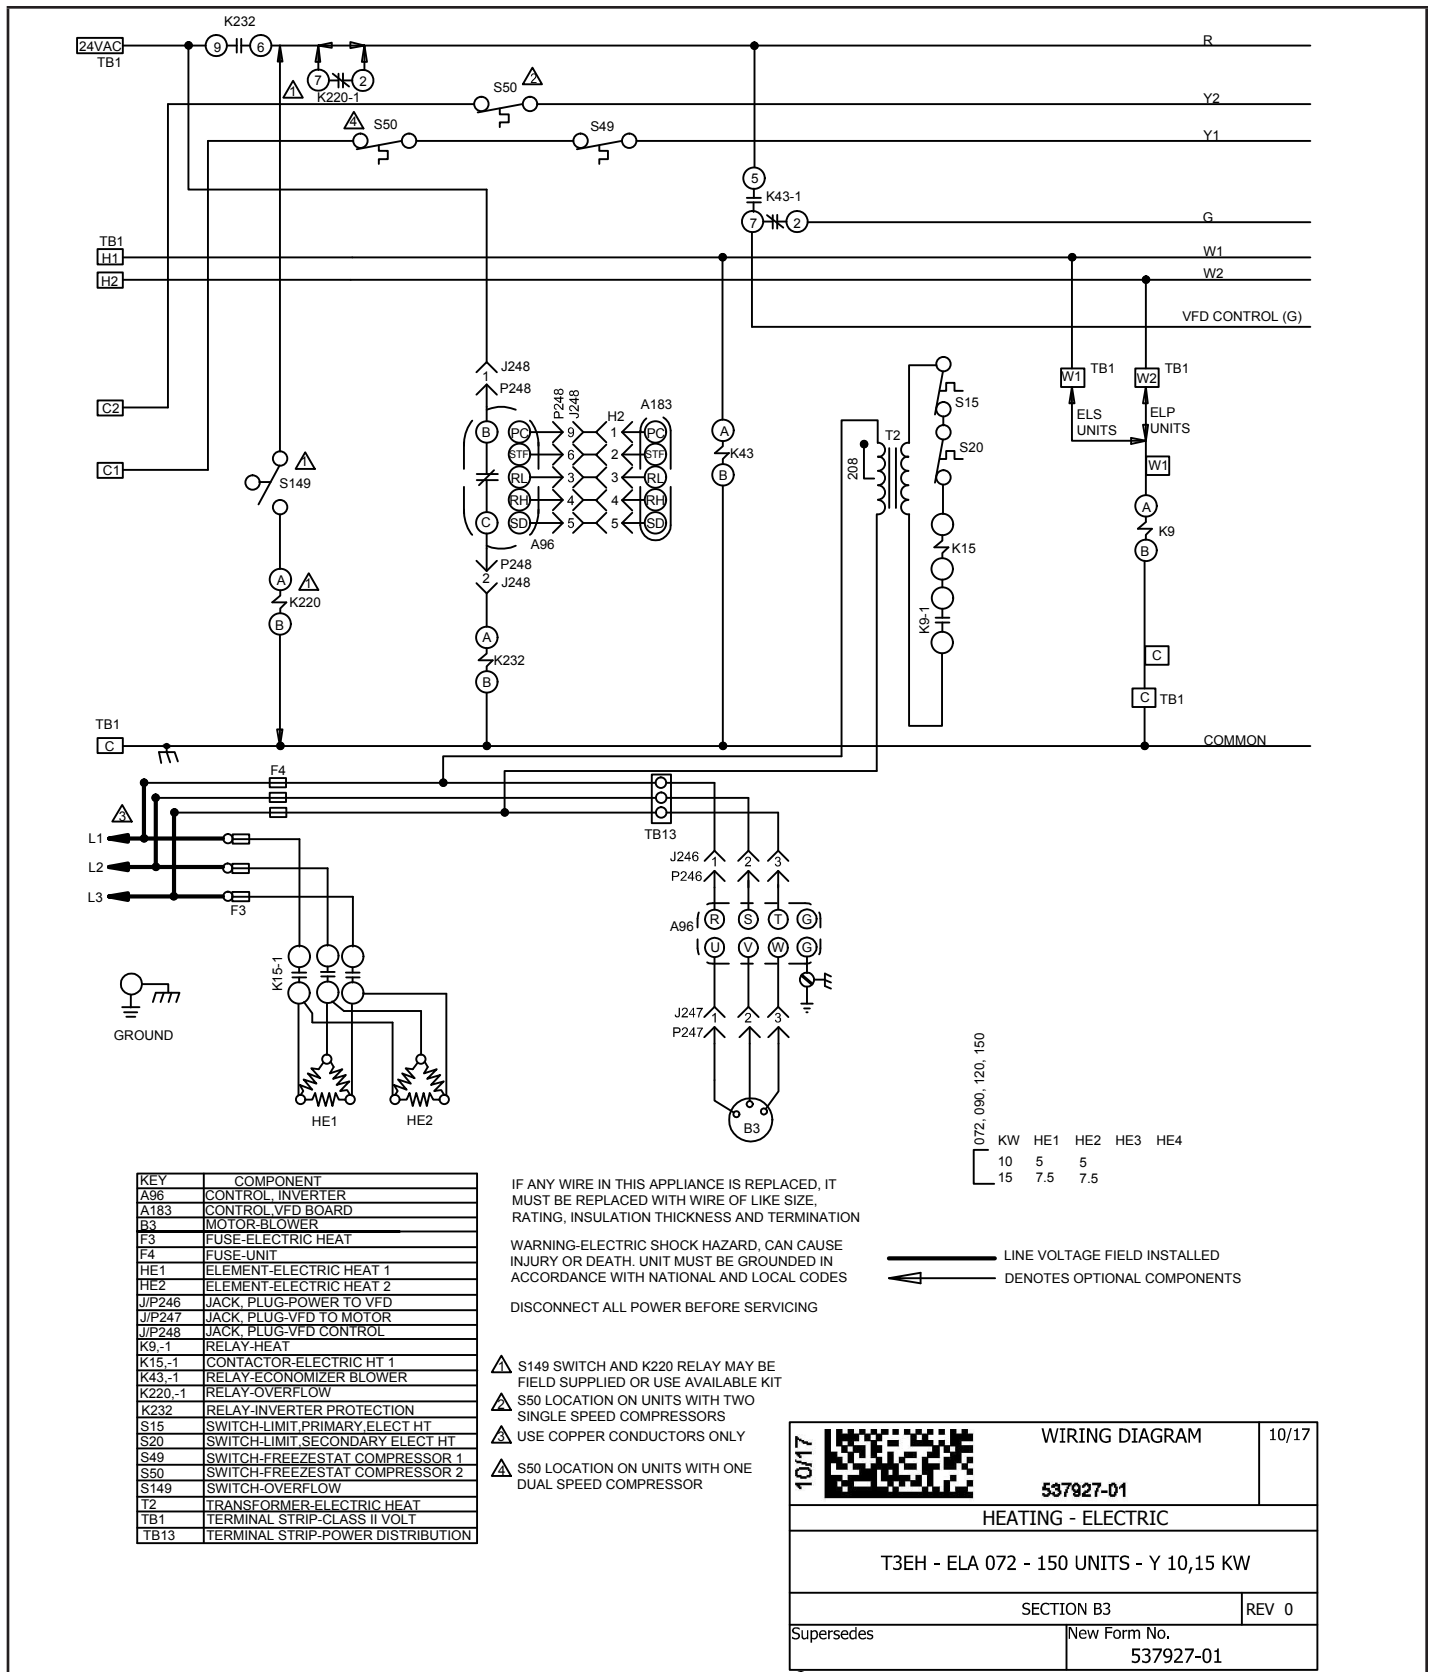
Typical Control Wiring used with ELS and ELP Outdoor Units
